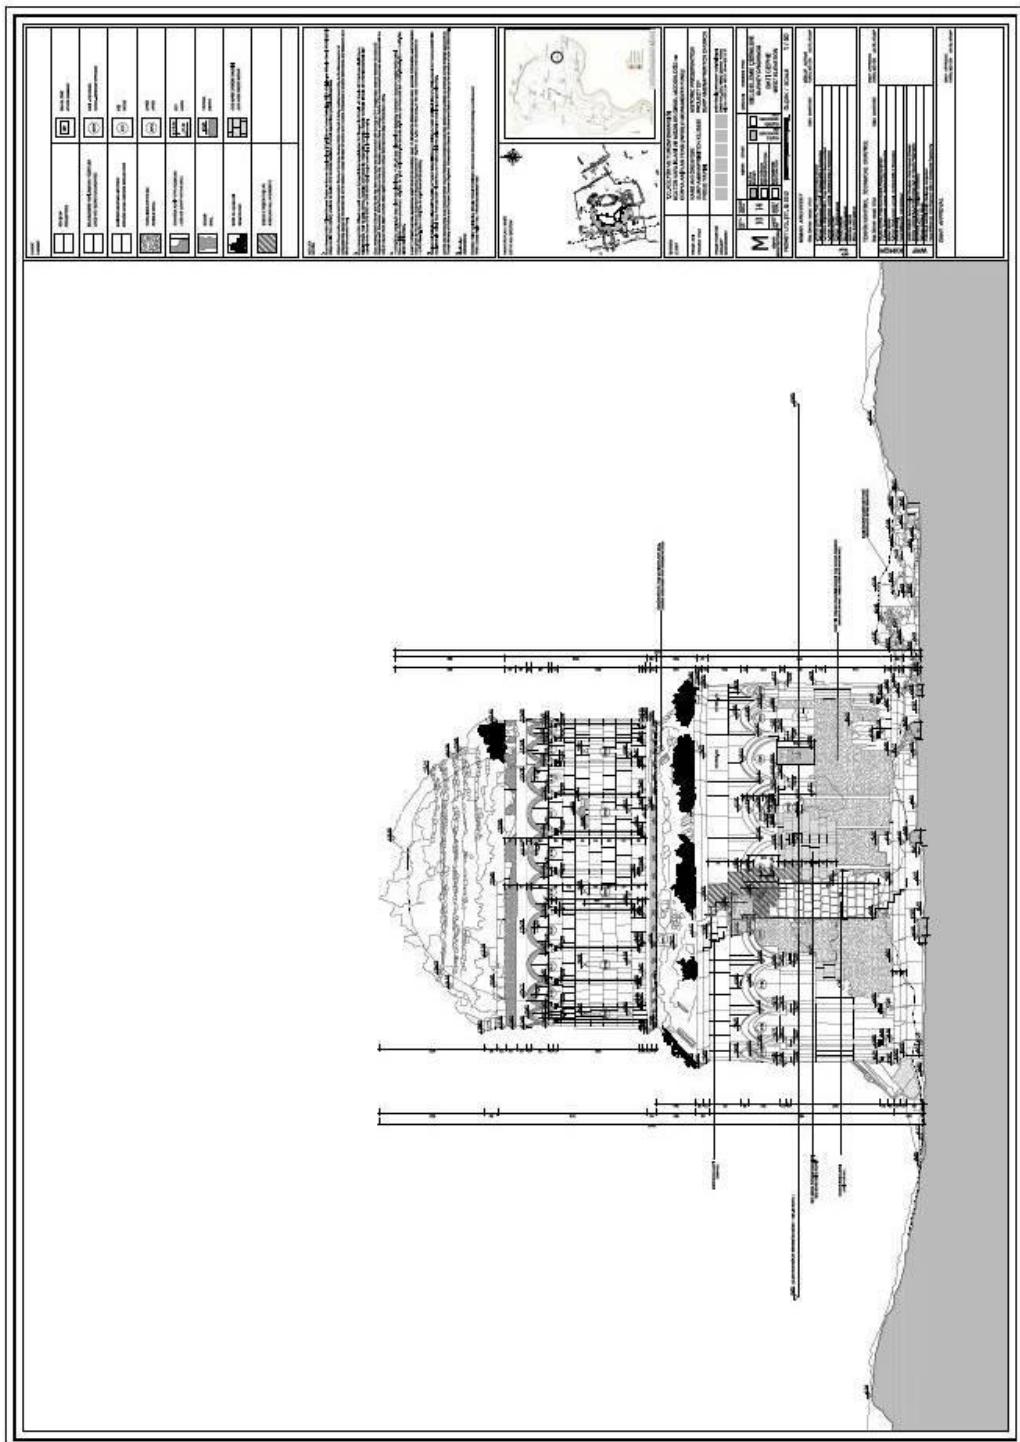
West Elevation, Historic Preservation Project of Surb Amena P'rkich Church, Promet Proje Ltd.Şti. 2012
